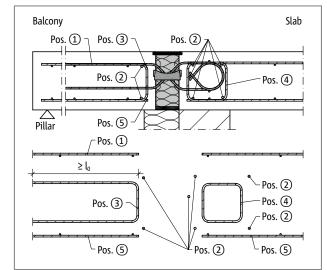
Schöck Isokorb® T type Q-E-VV: On-site reinforcement
